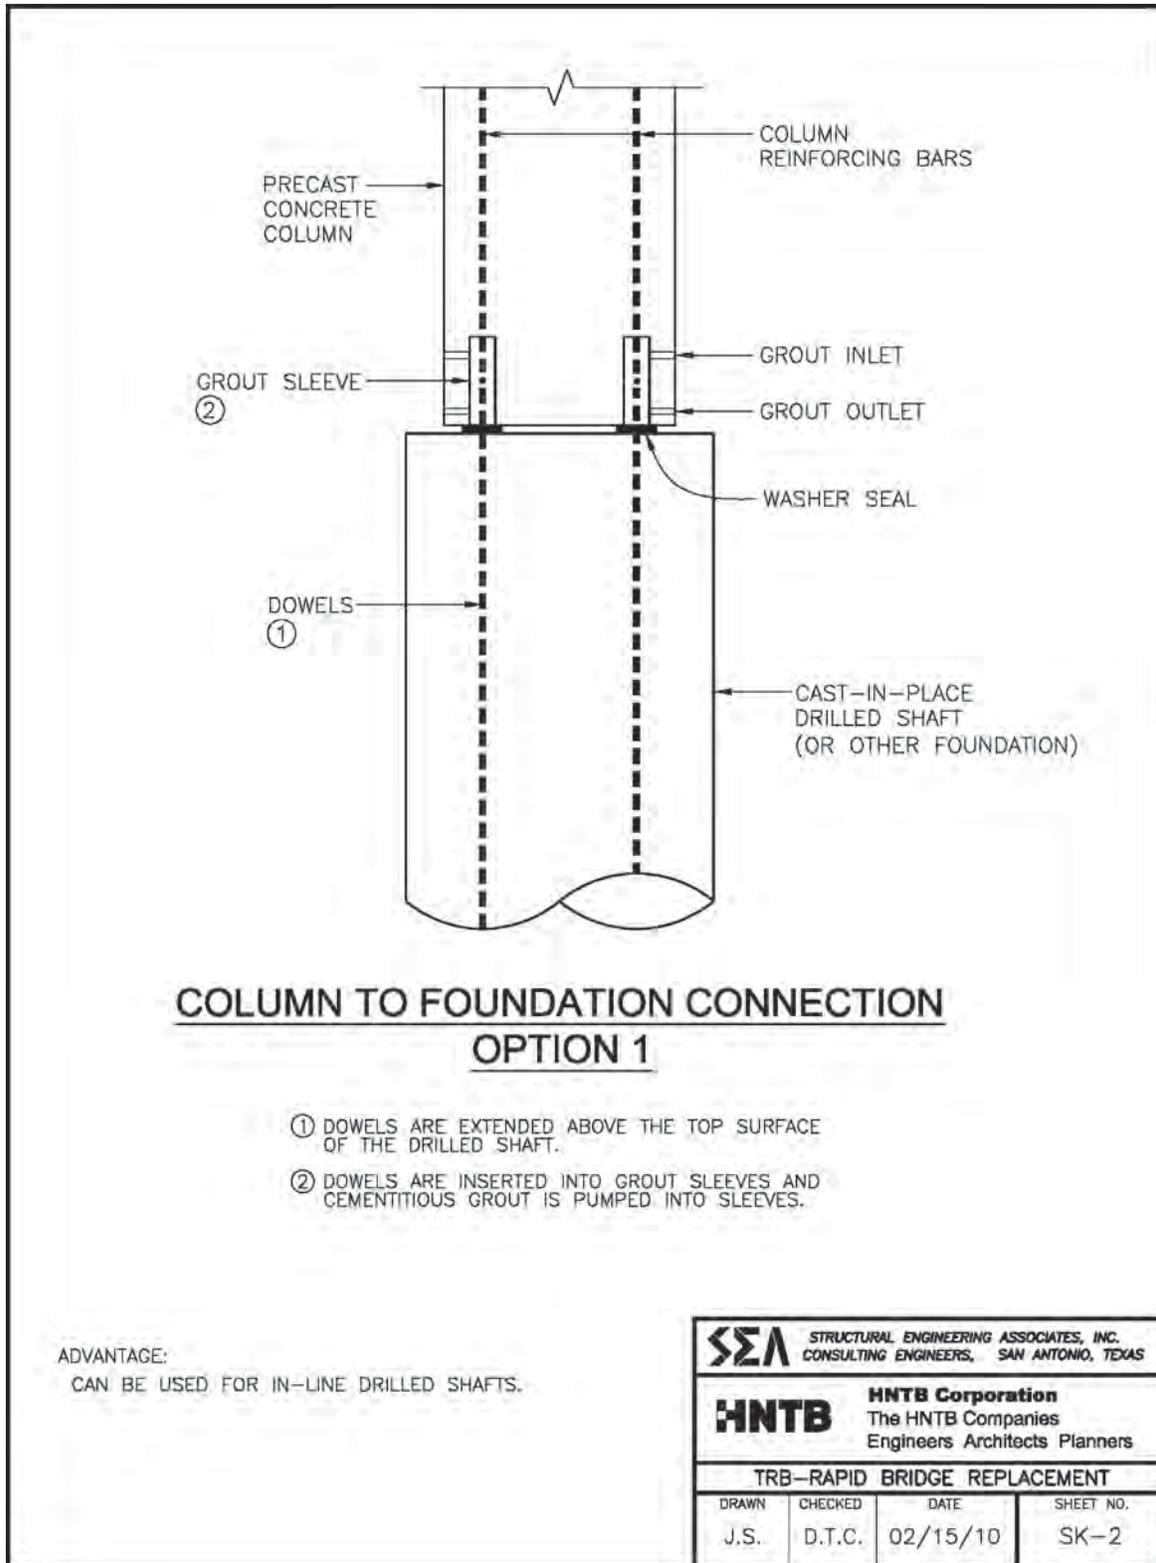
Alternate column-to-foundation connection—Option 1.
